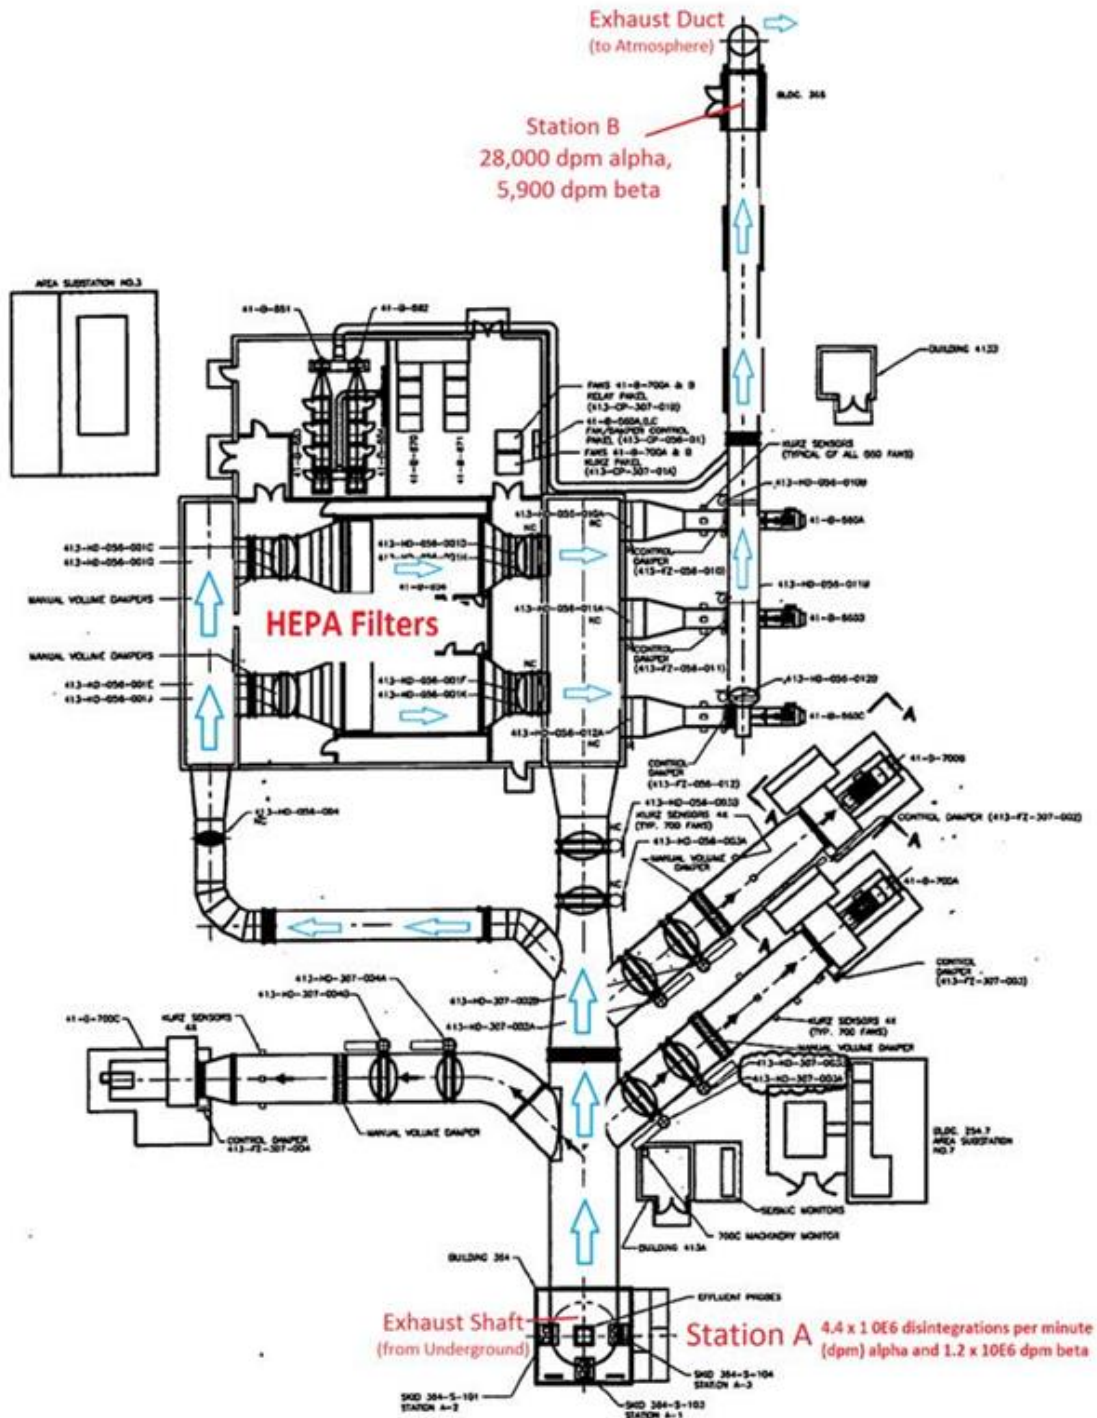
Exhaust Filter Building Ventilation Components Plan View
